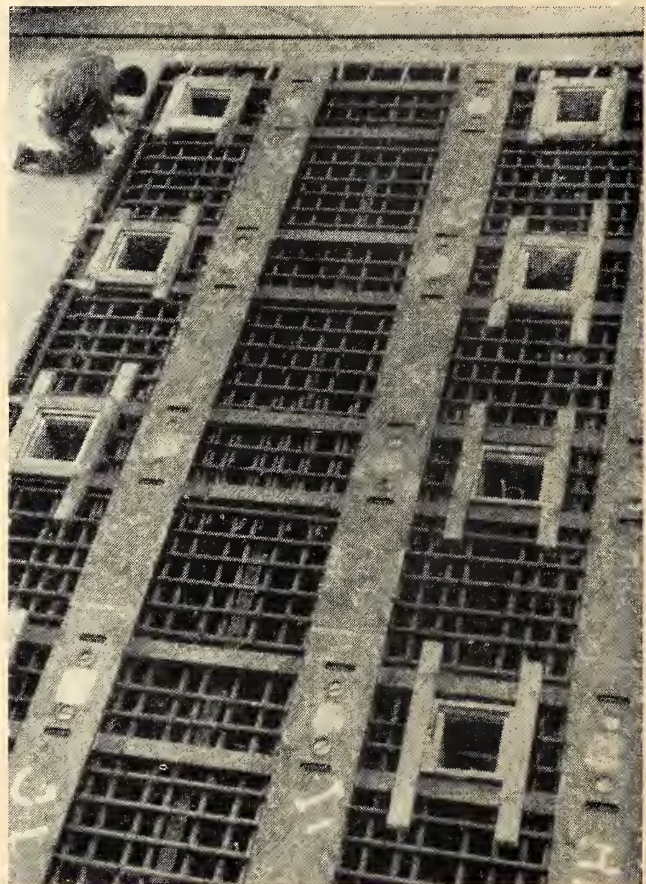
Structural and reinforcing steel of test slab before concrete was placed.
